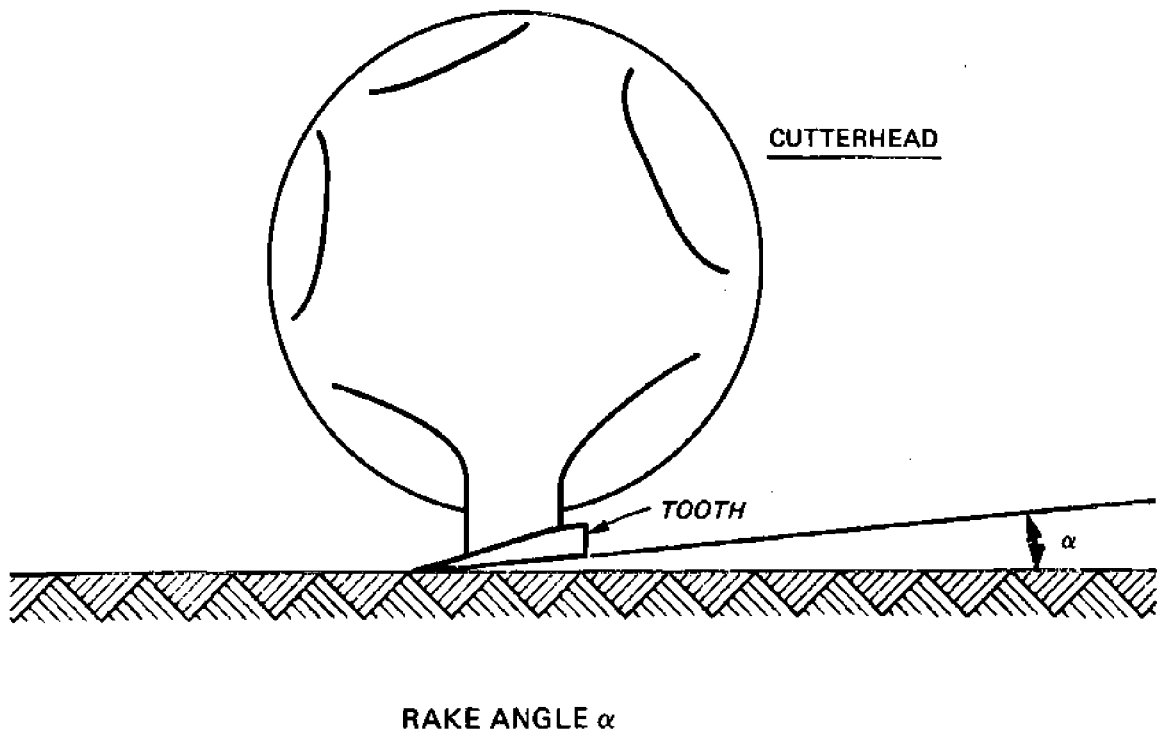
Schematic front view of a cutterhead showing the cutter tooth rake angle.
